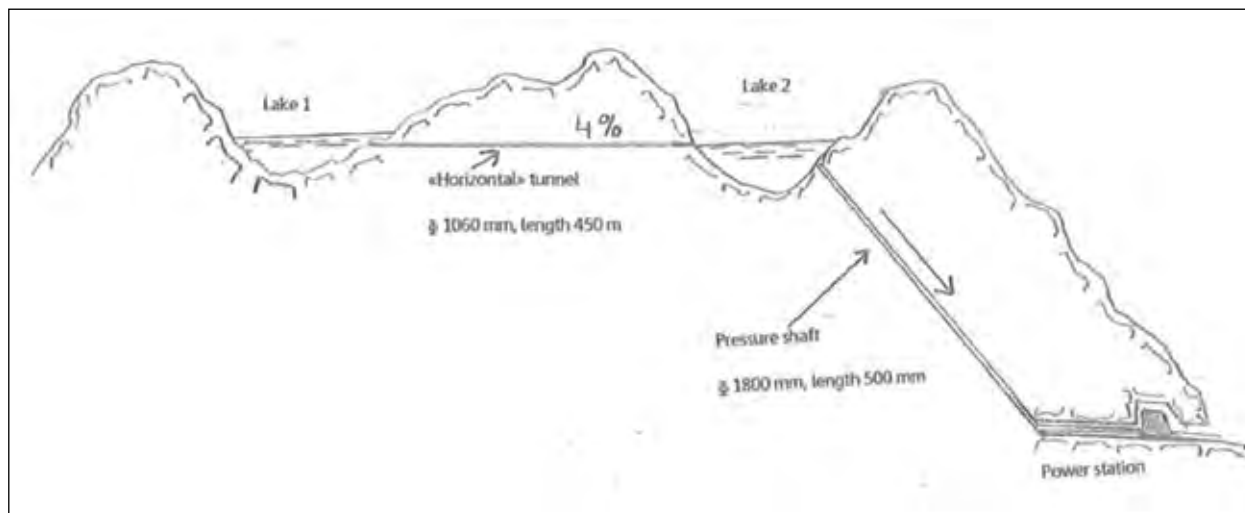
Hydroelectric power project where it is possible to use the raise drill equipment
